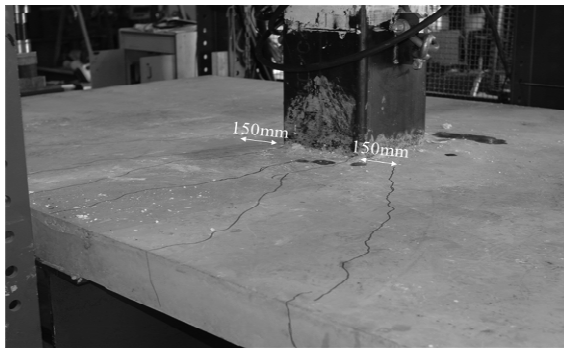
Concrete cracks at 150 mm from column face.
